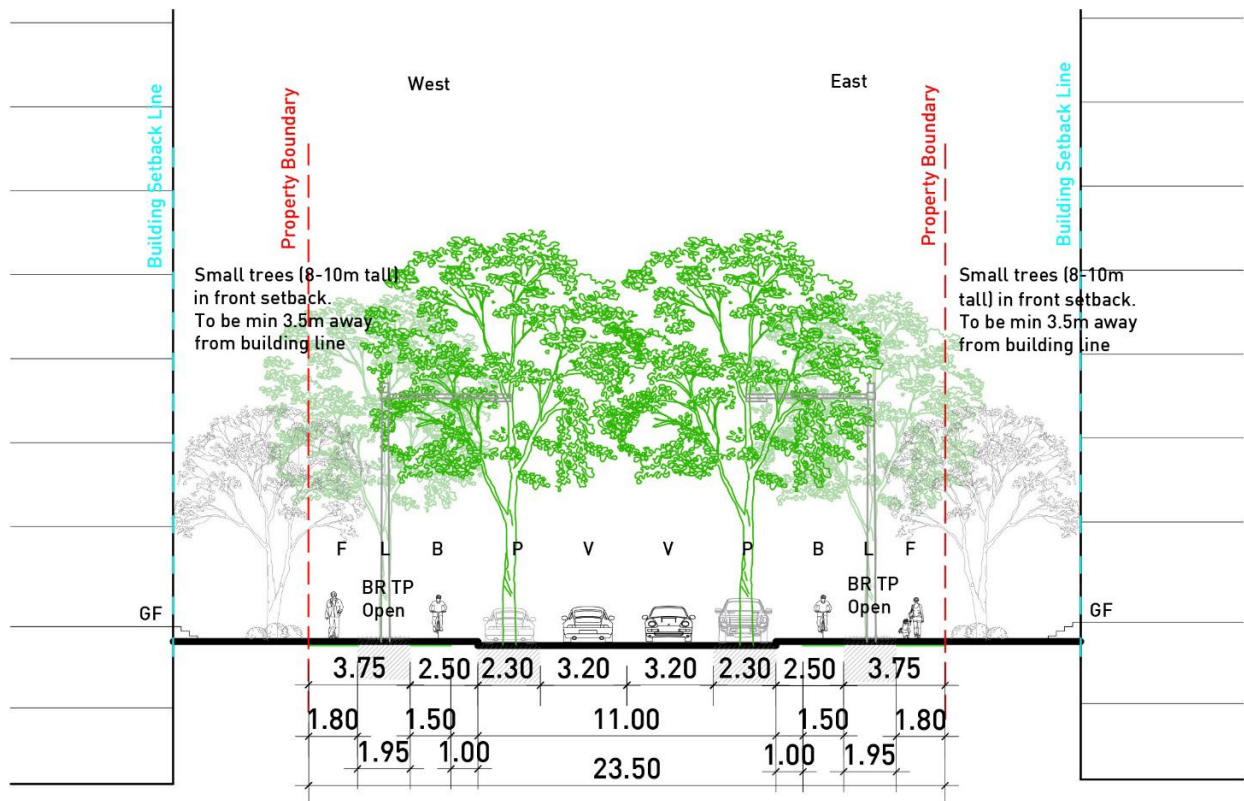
Type 2A Main Road with Cycle Tracks (NSR 3)
